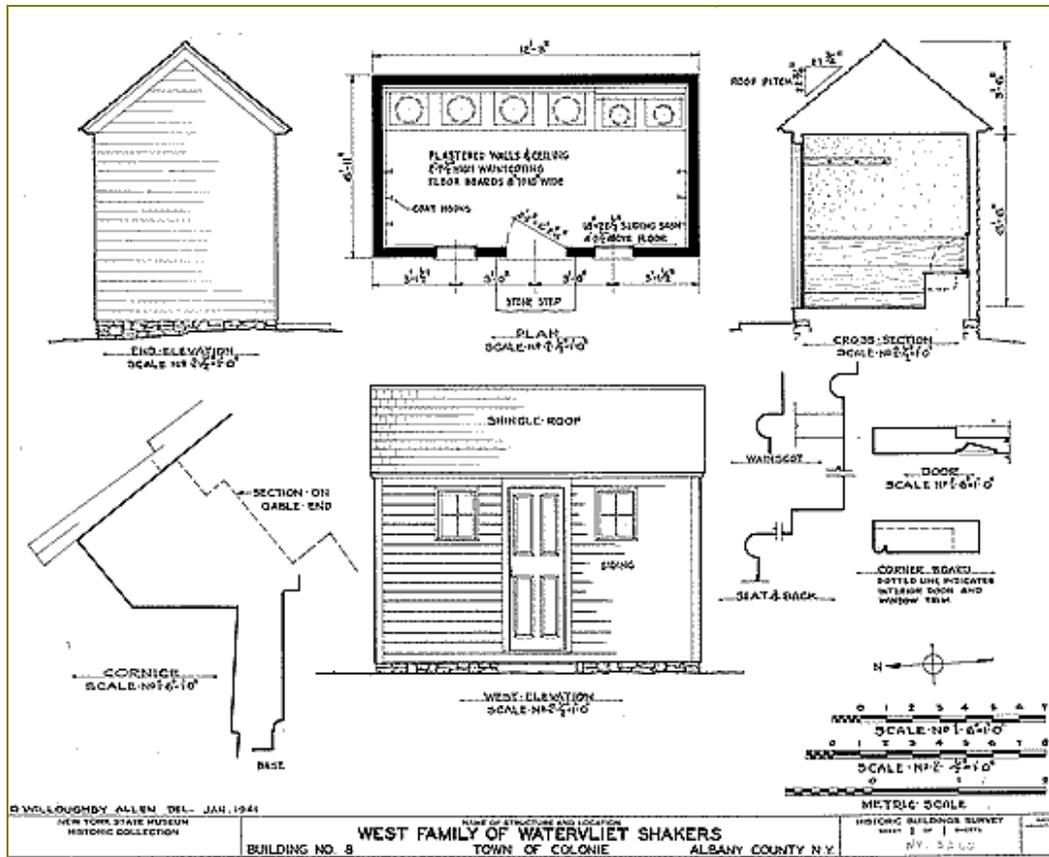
HABS drawing of a Shaker privy at Watervliet, New York (Historic American Buildings Survey 1941)
